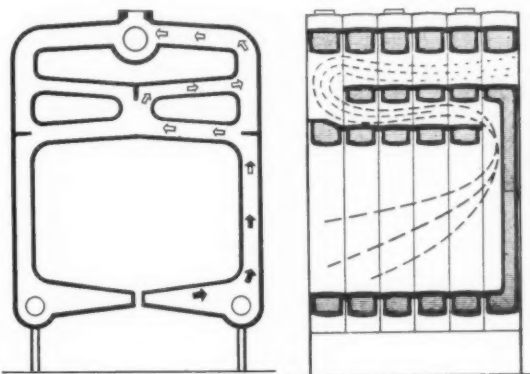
Left, cross section and, right, part long section through a cast iron sectional boiler.
